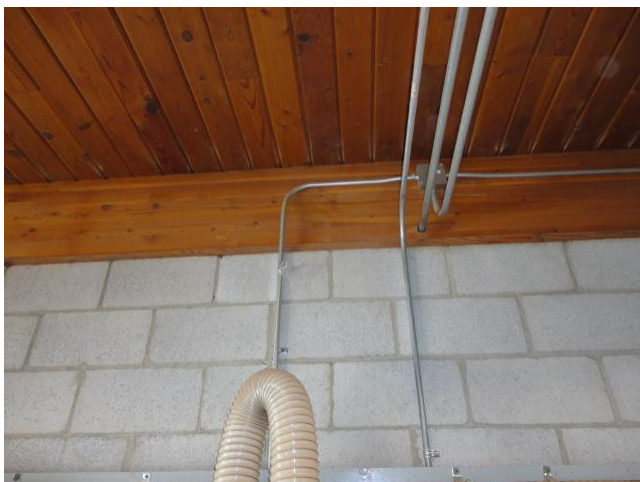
Install surface mounted conduits along top of CMU wall, then up and through the glu-lam beam (to match existing) from the Carpenter Shop into the Radio Shop.
